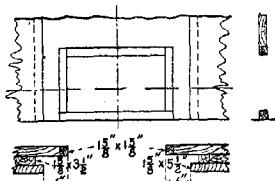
Elevation and sections of broad-edged orifice with wood gate guides moved out 6 inches.
